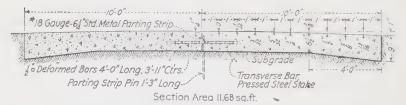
Cross section of standard concrete pavement—Wisconsin Highway Commission.
